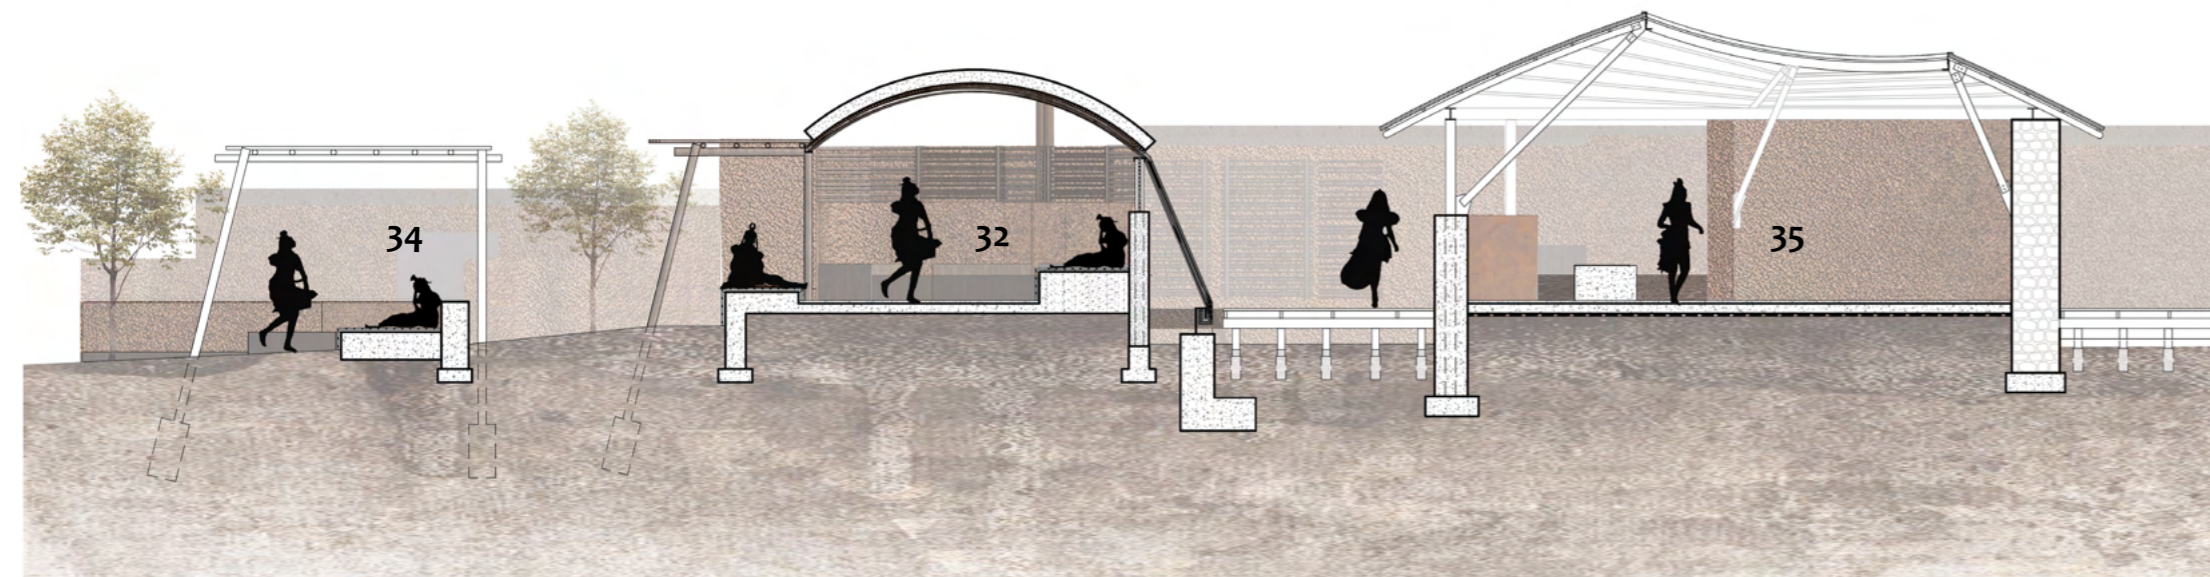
Ovahimba Pavilion Section D-D (Author 2021)
